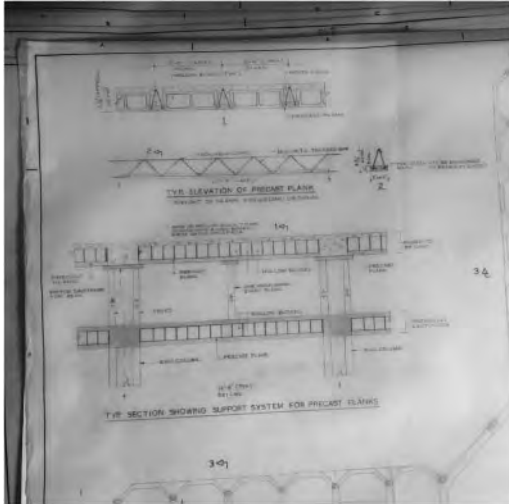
Mahendra Raj Archives, Part Drawing, Maurya Hotel, New Delhi (26 Aug 1976) Typical Section and Elevation details of Precast Planks.
